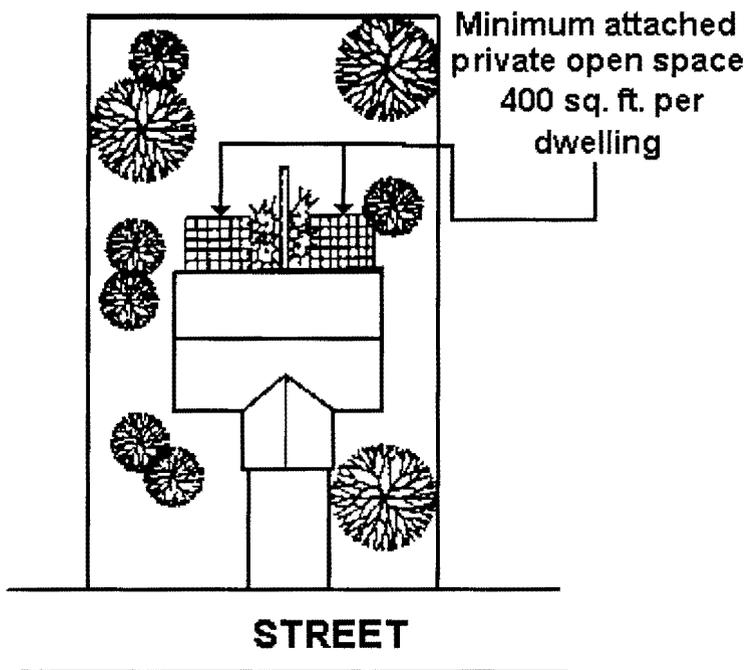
, Print and Group Open Space, Section 11-8-3(H).
